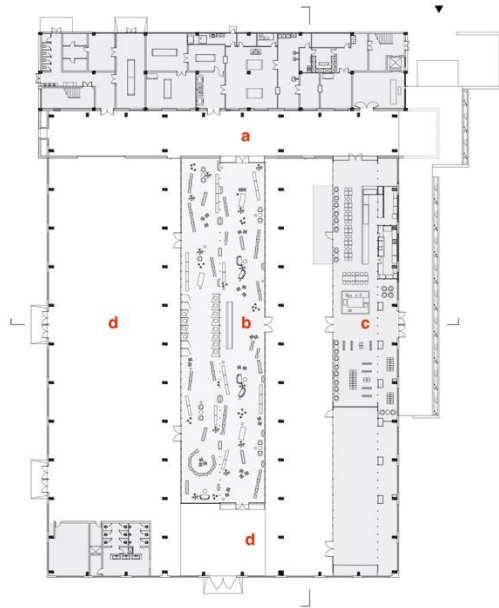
floor plan of the Cotton Lab (copyright: Atelier Archmixing)
